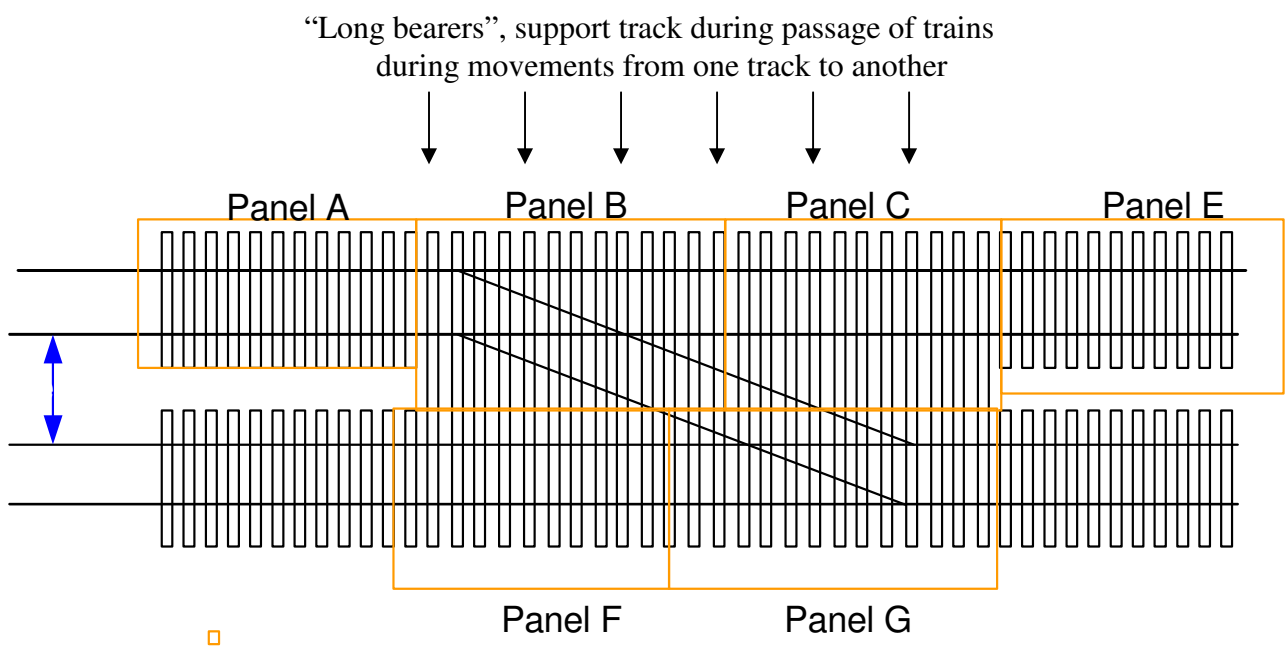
Typical S&C crossover track layout showing long bearers and “modular” panels
